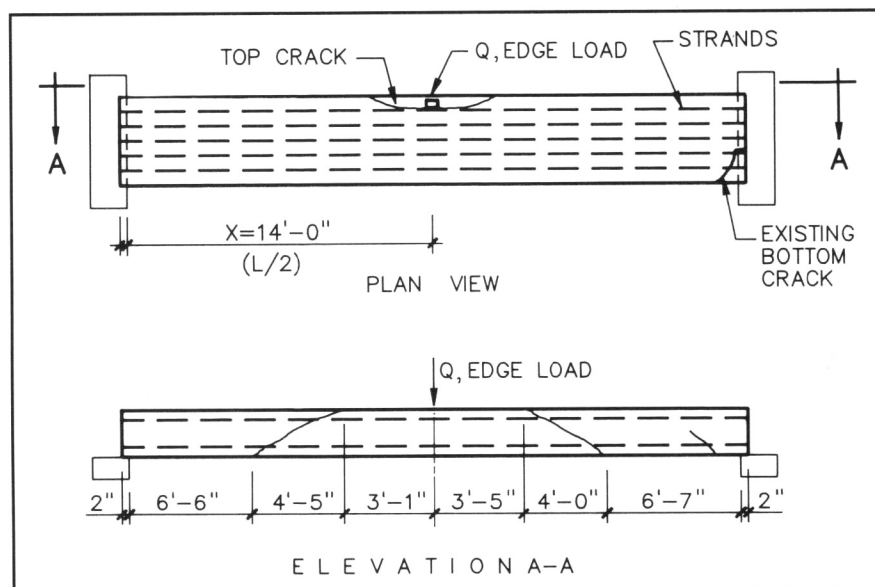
Plan view and side elevation sketches showing extension of cracking.
